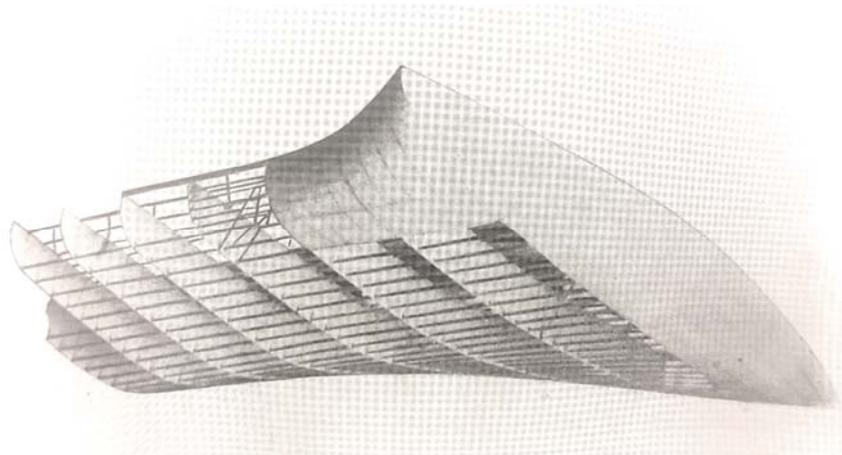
Notre Dame du Haut's* roof construction detail (Ford, 1996, p. 190).
